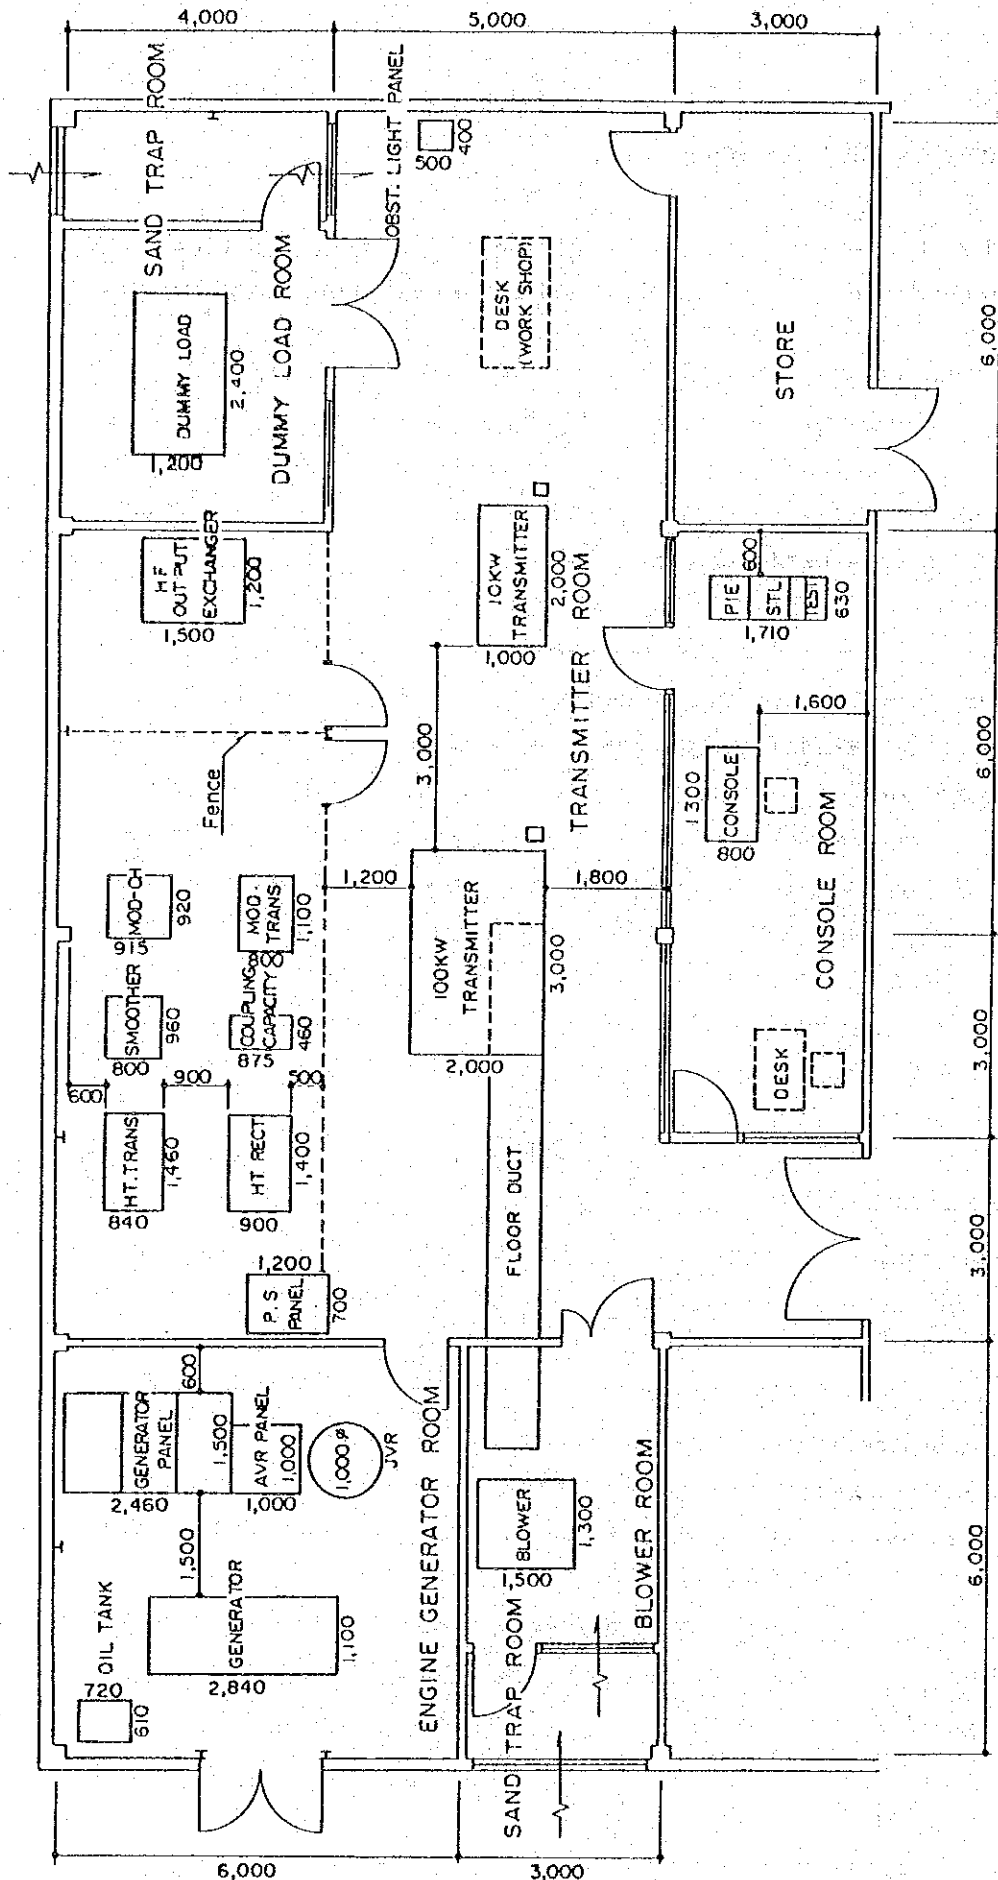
Arrangement of Main Equipment and Spaces around the Equipment
